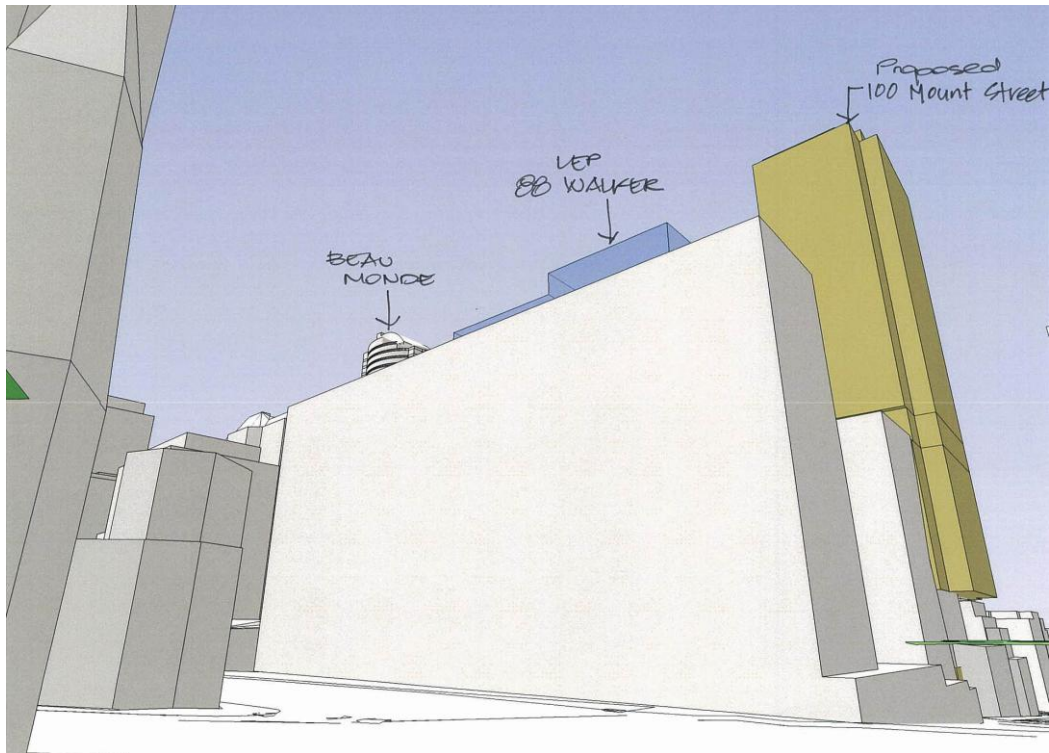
View Analysis of proposed development at 100 Mount Street from south west of MLC Centre with development at 88 Walker Street within the provisions of the draft LEP shown also.
